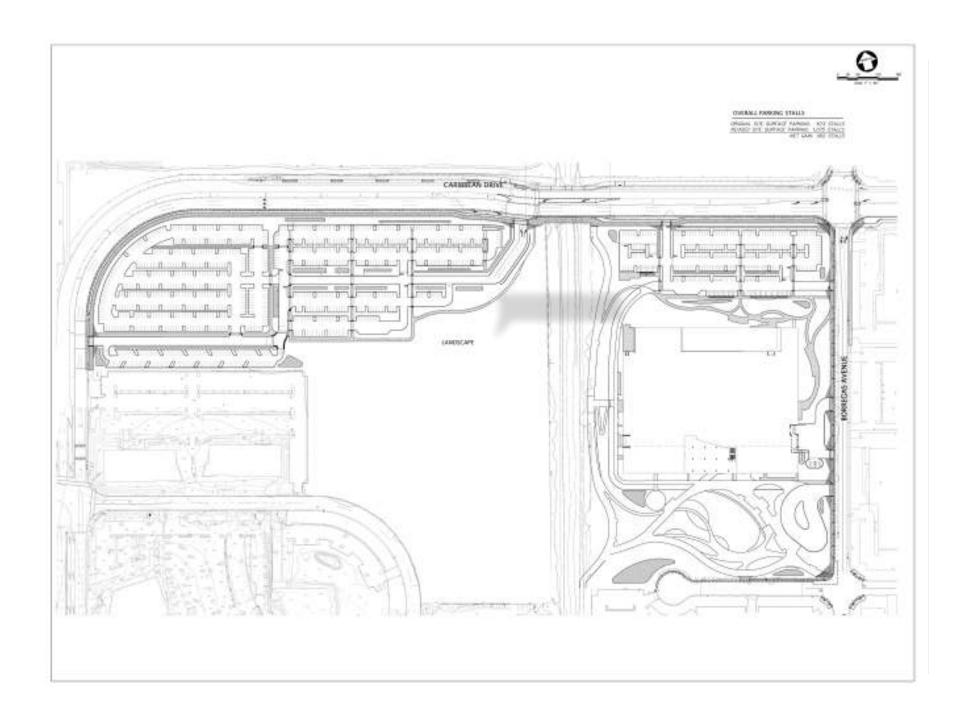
Single Building Alternative Site Plan Google Caribbean Campus
